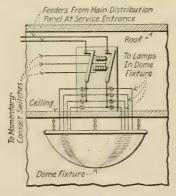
Remote-controlled switch, installed between ceiling and roof, to control lamps in a large dome fixture.
